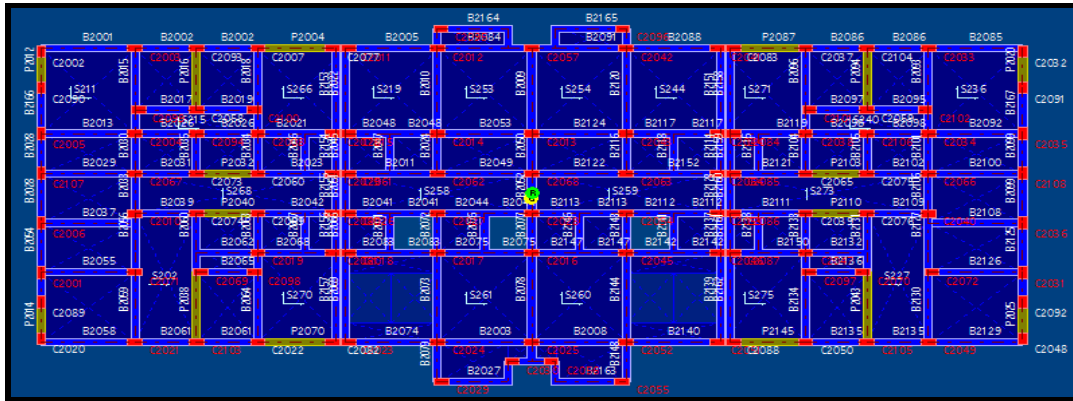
Plan Twenty Five Stories the Coupled Shear Wall System
